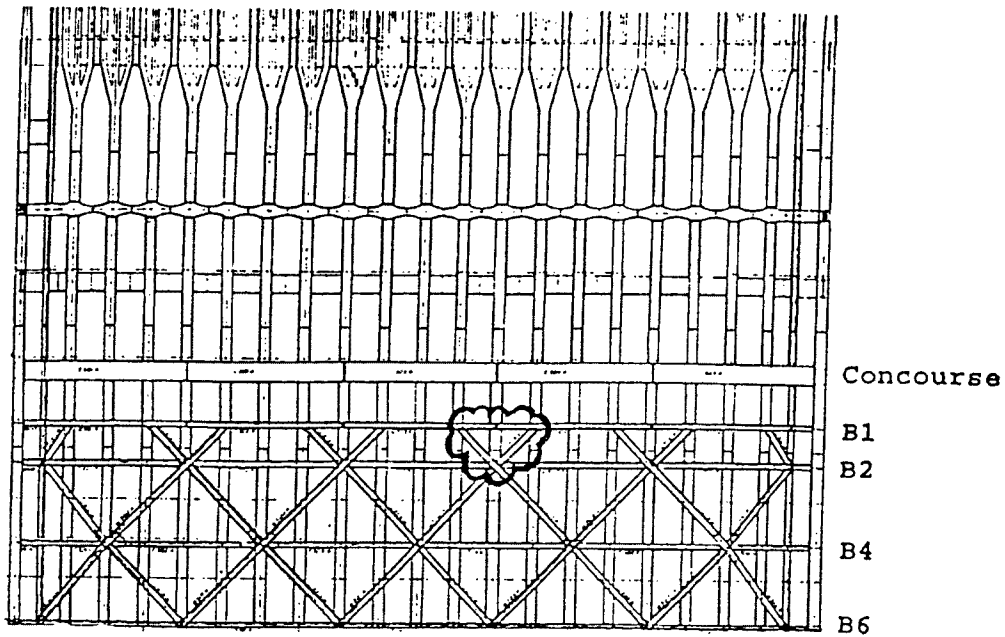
South elevation of Tower 1, indicating damaged area.
